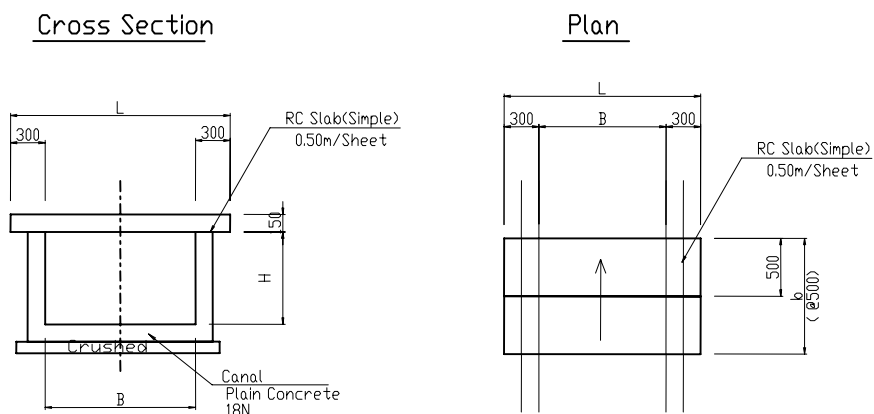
Crossing Slab Bridge for the Entrance to House
